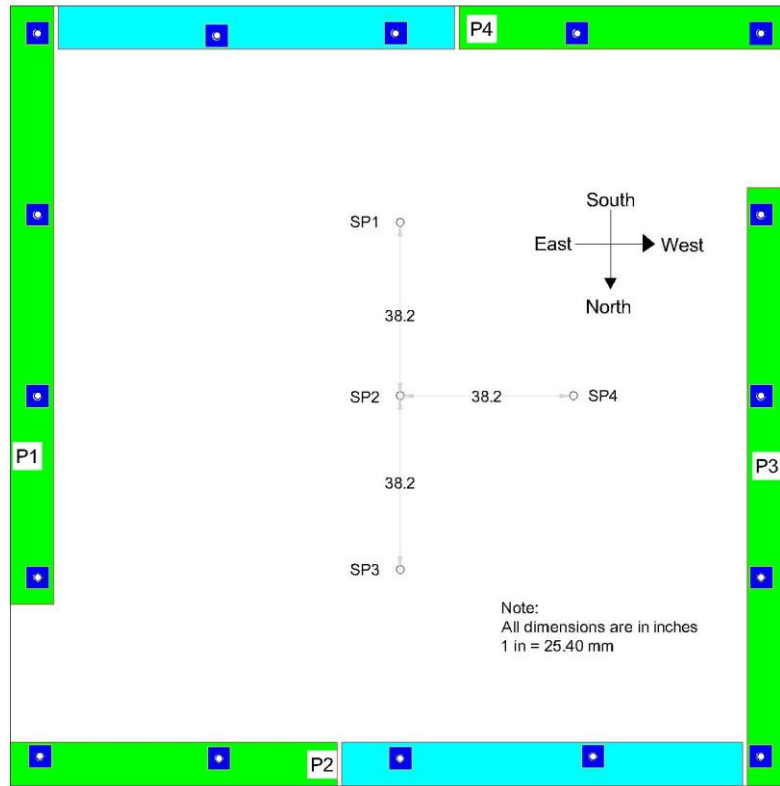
String Pots Locations for Sandwich Slab Specimen C
